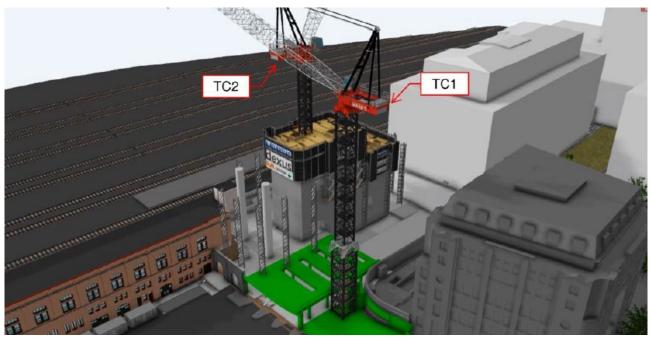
Tower Crane Overview – note TC1 adjacent to heritage brick wall.
